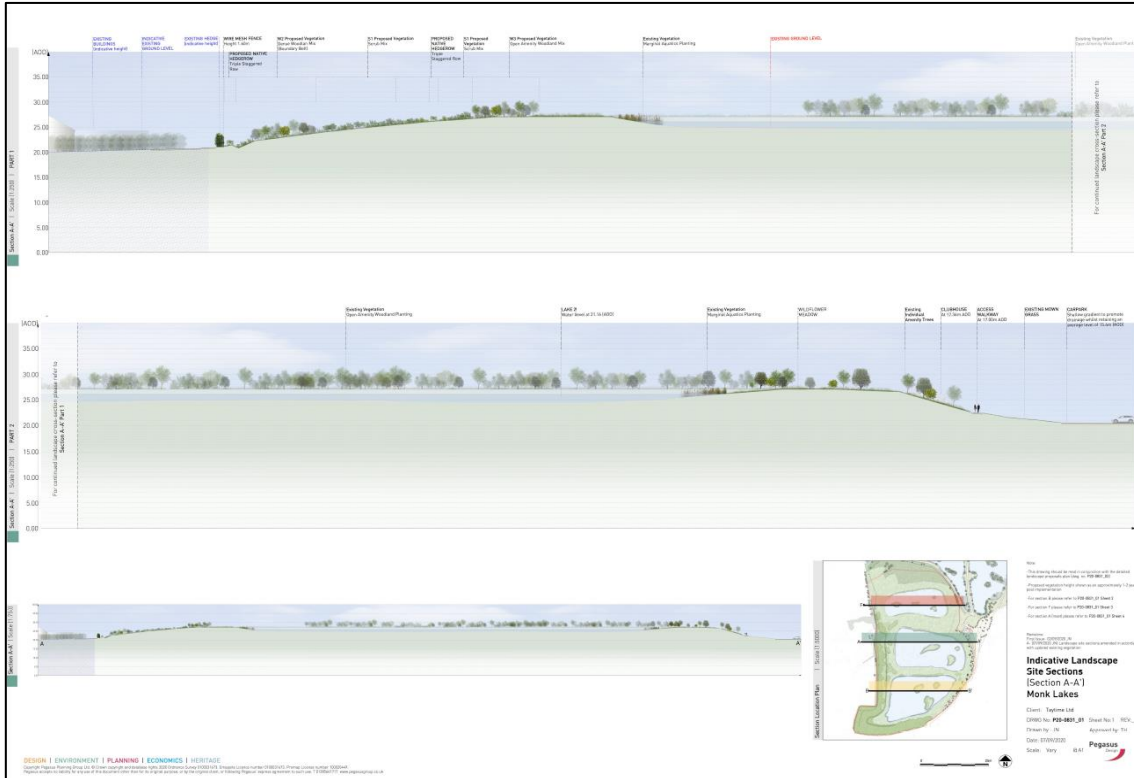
Sectional Drawing Section A-A (ref. P20-0831_01 Sheet 1)
